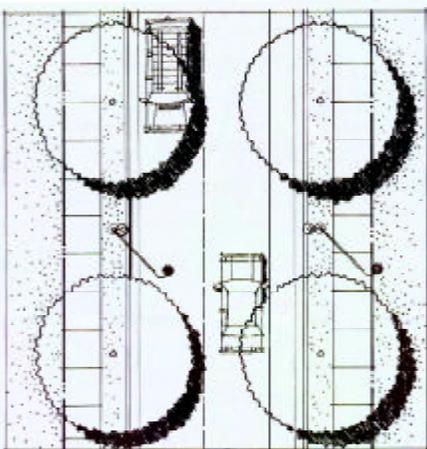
Typical Mixed-use Streetscape Plan.
